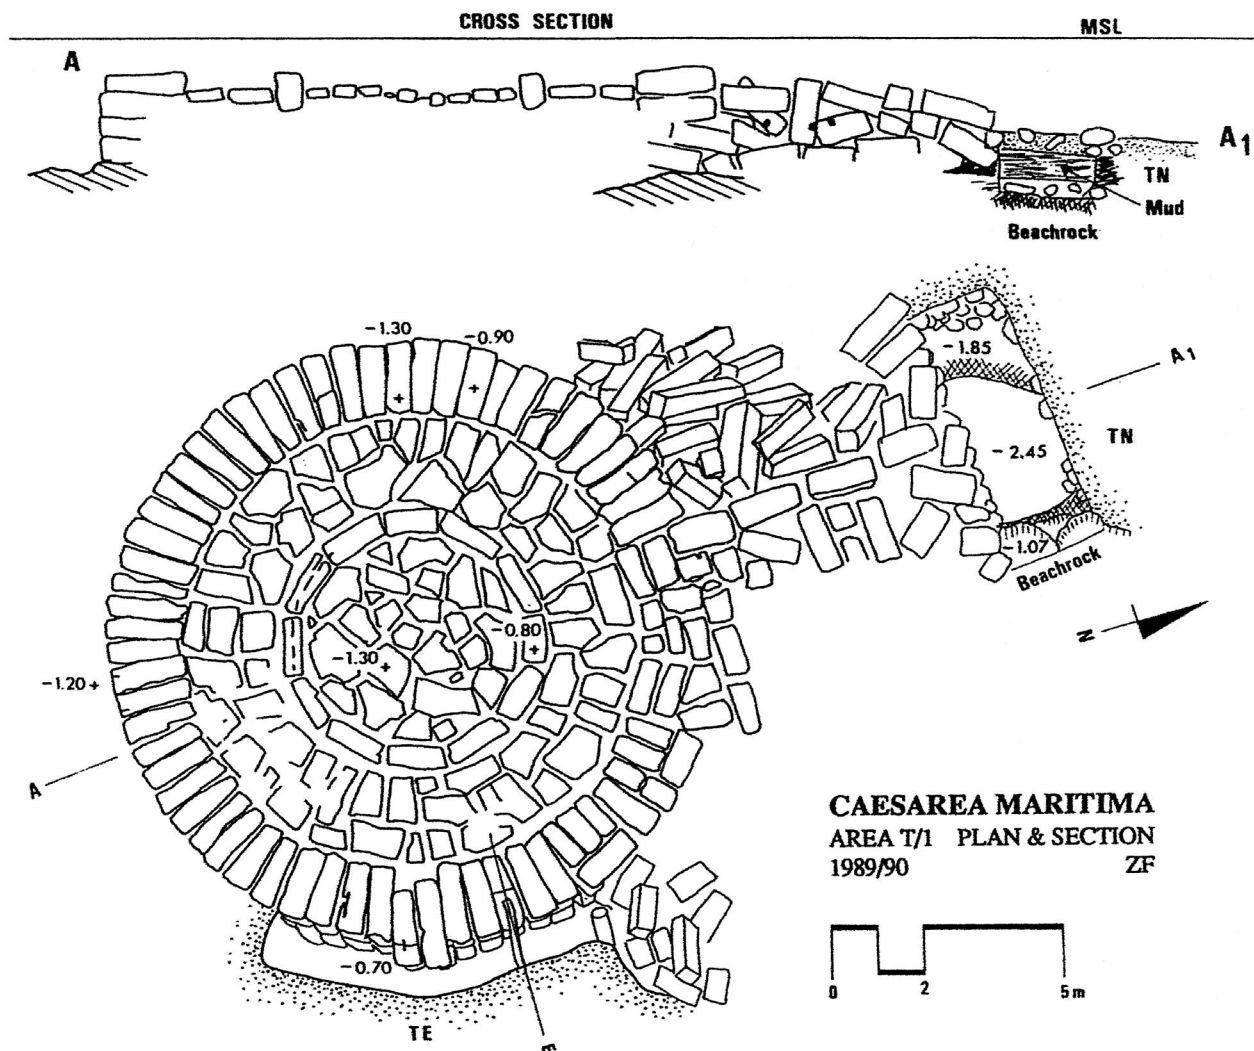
Top plan and N-S section across the tower at T.1 (Holum et al. 1992, Fig.2)
